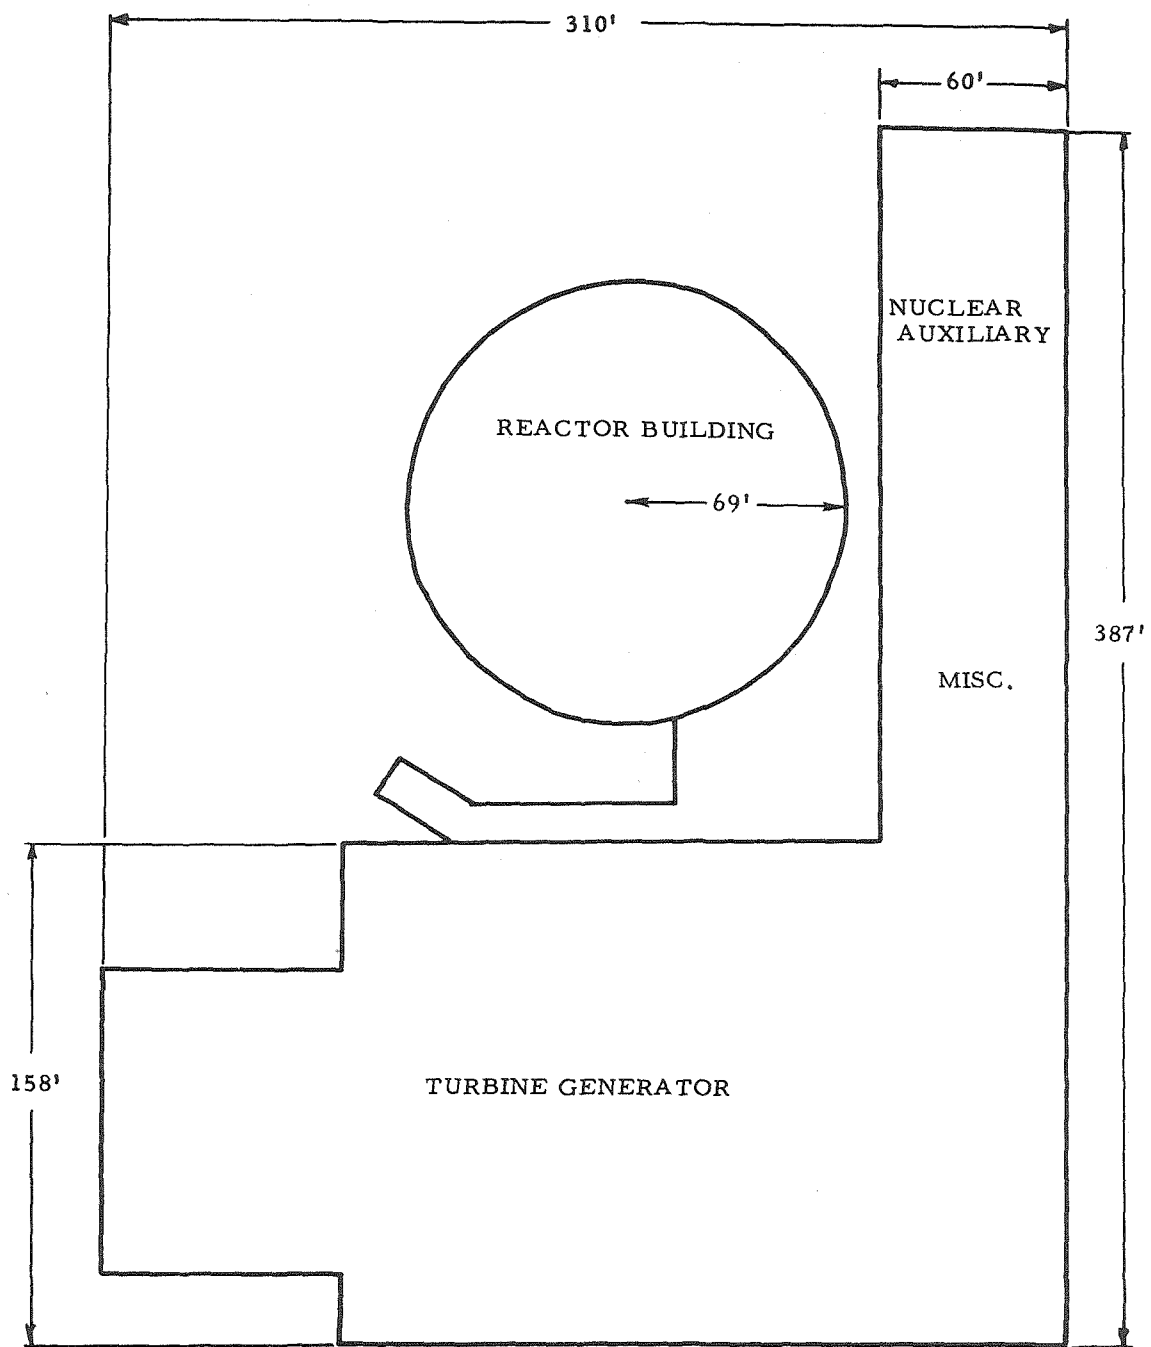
PWR Above Ground Plant Layout (Typical)
